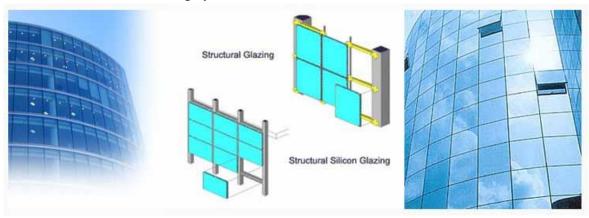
Curtain Walling (Structural Glazing) (source: http://www.tropicalalum.co.tz/?page_id=23)
